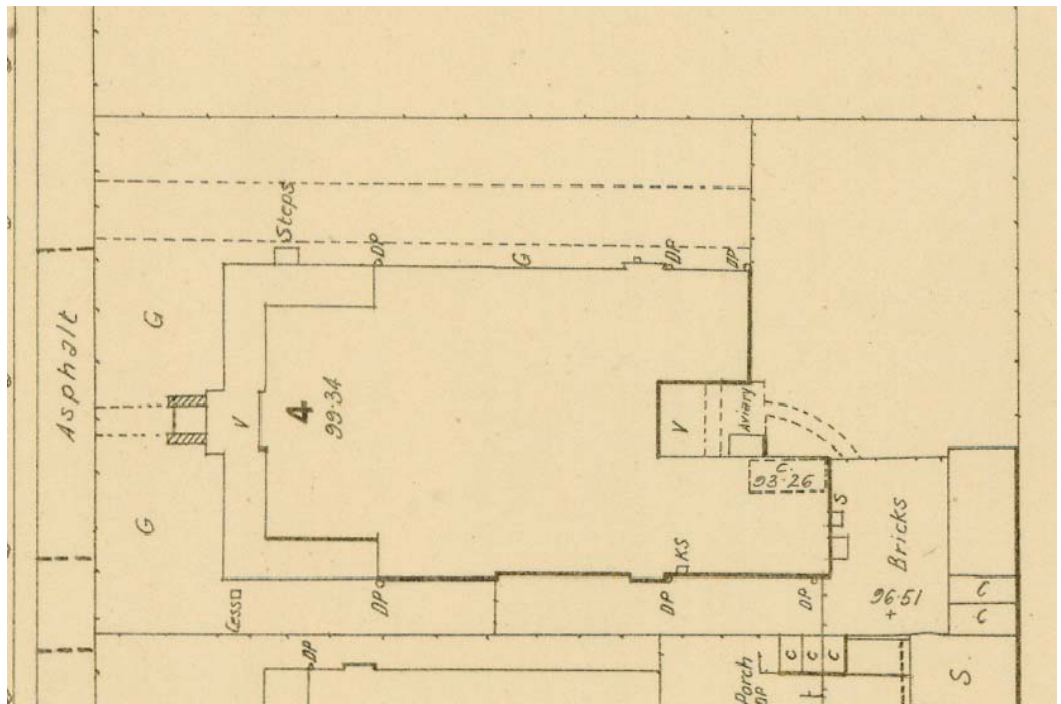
MMBW Detail Plan No. 938, dated 1900; no. 4 Wallace Avenue is now no. 20 Wallace Avenue (source: SLV).
